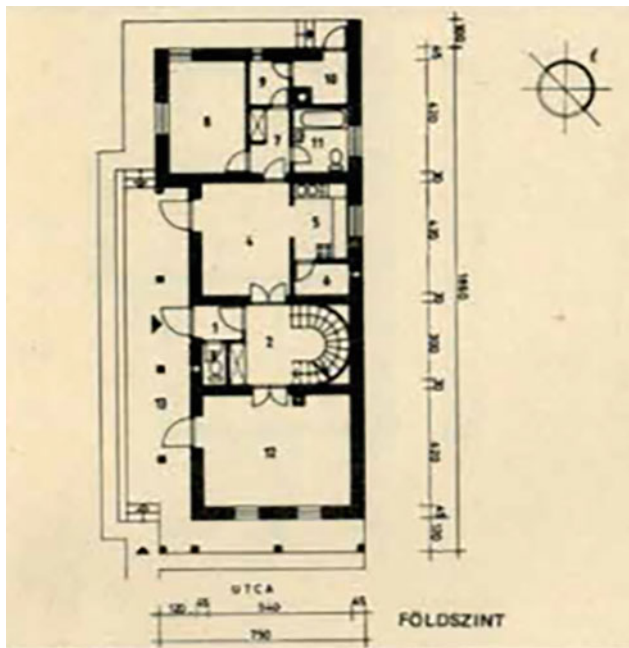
(Right) Ground floor plan of the porch house. *Resource* Somogy megyei családiház tervek
